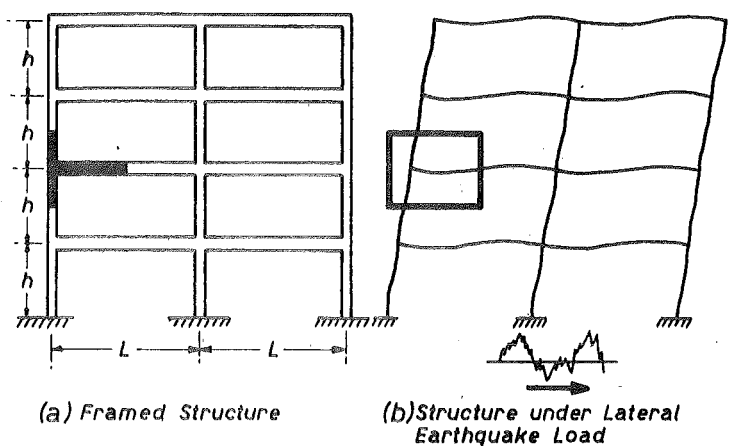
BEAM-COLUMN TEST SPECIMEN
